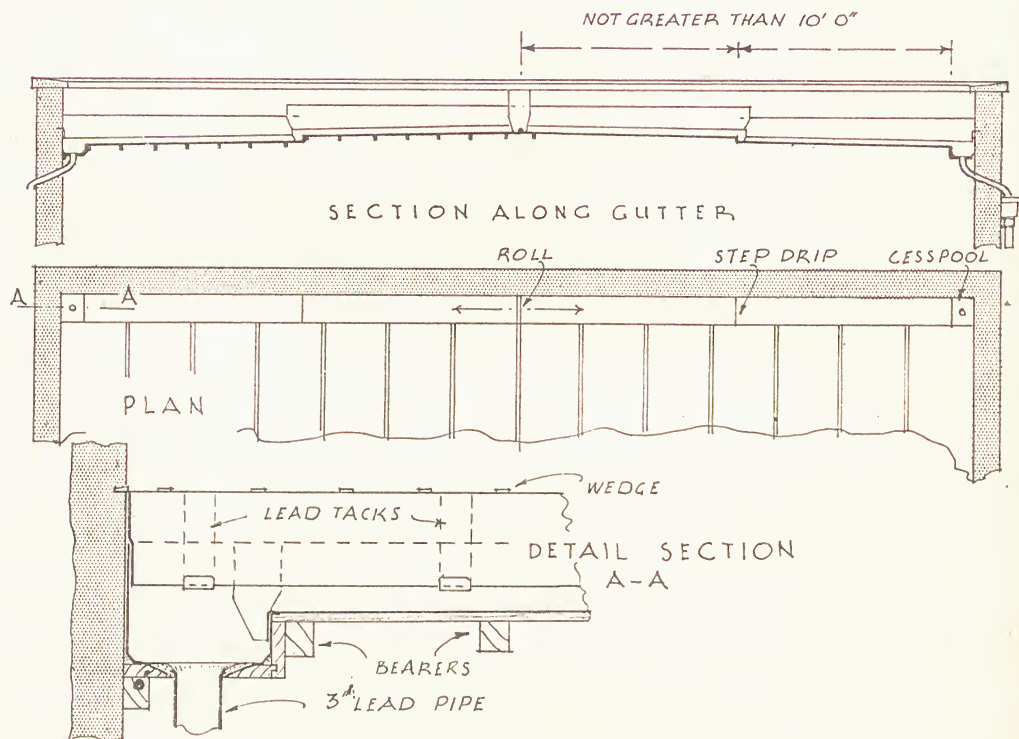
Lead parallel gutter against boundary or parapet wall.
